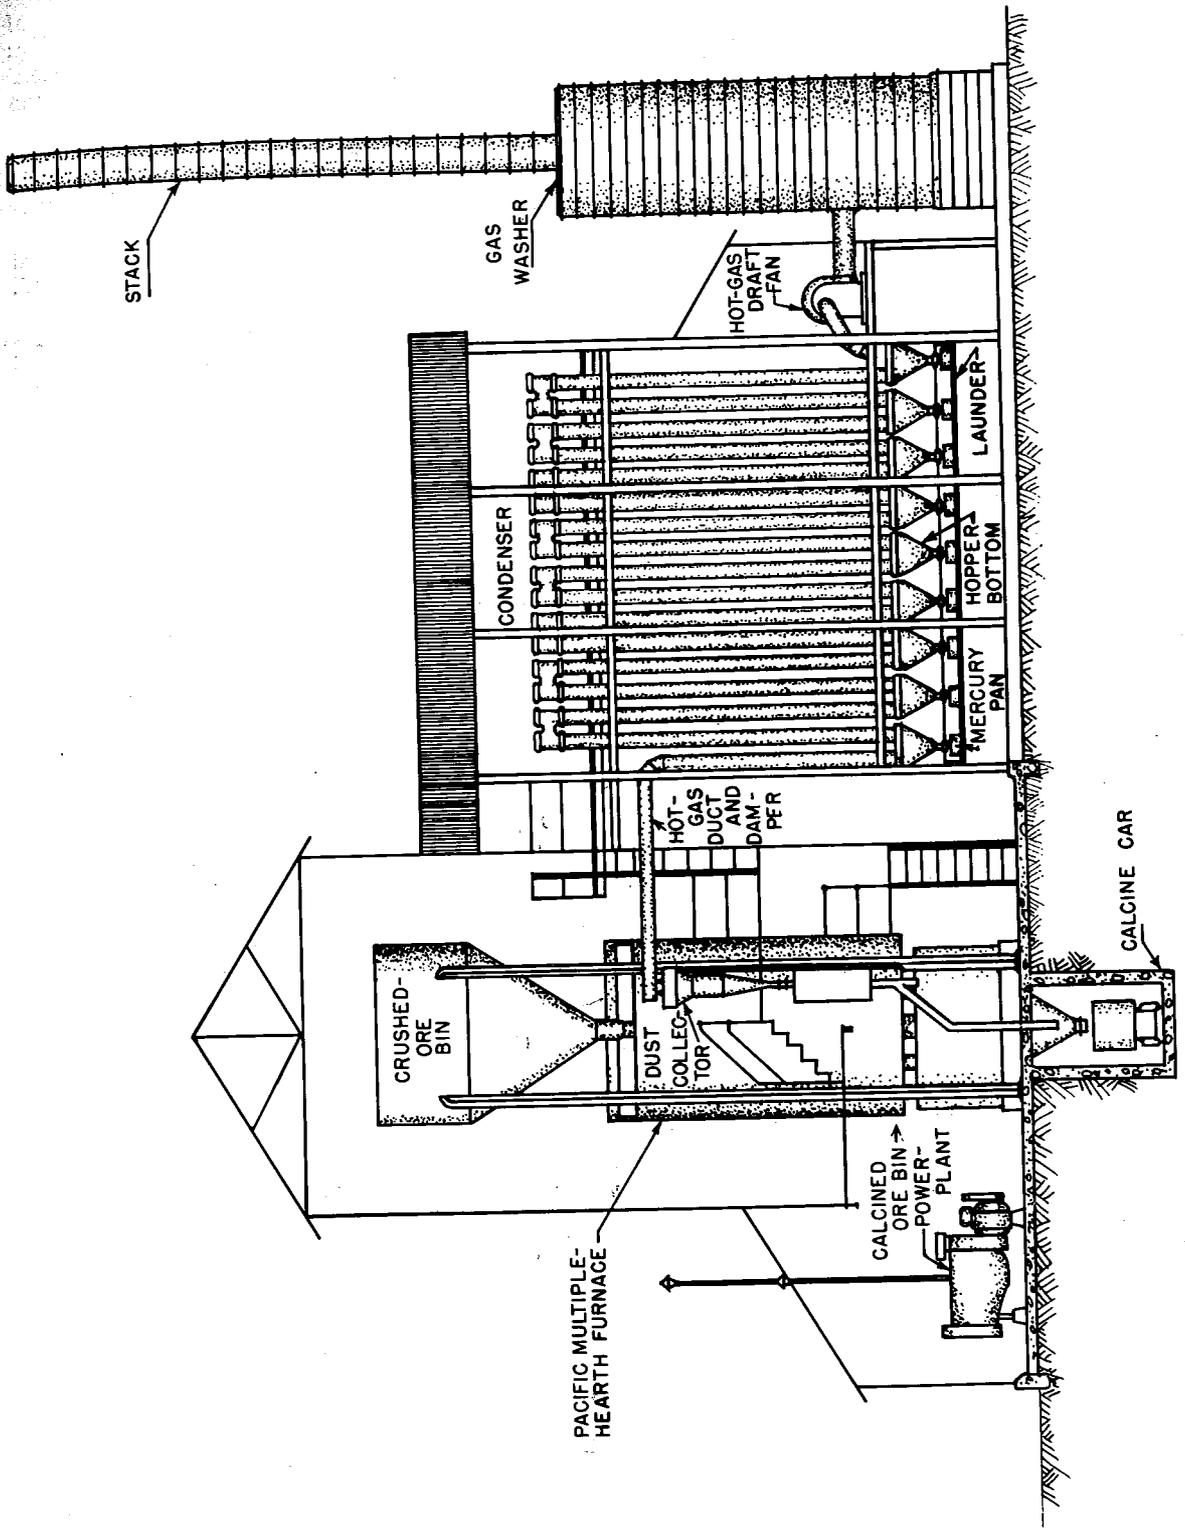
Layout—Multiple-Hearth Furnace Plant.
